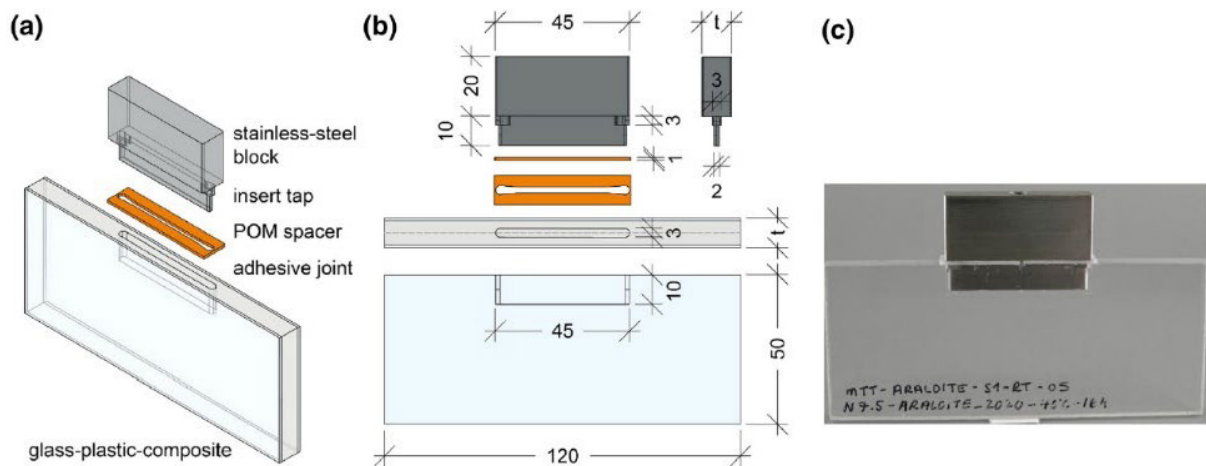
Components and dimensions of the adhesive connection: a isometric view of components, b associated dimensions and c front view of assembled specimen. Source: Hänig, J., & Weller, B. (2022). Integrated connections for glass– plasticcomposite panels.
